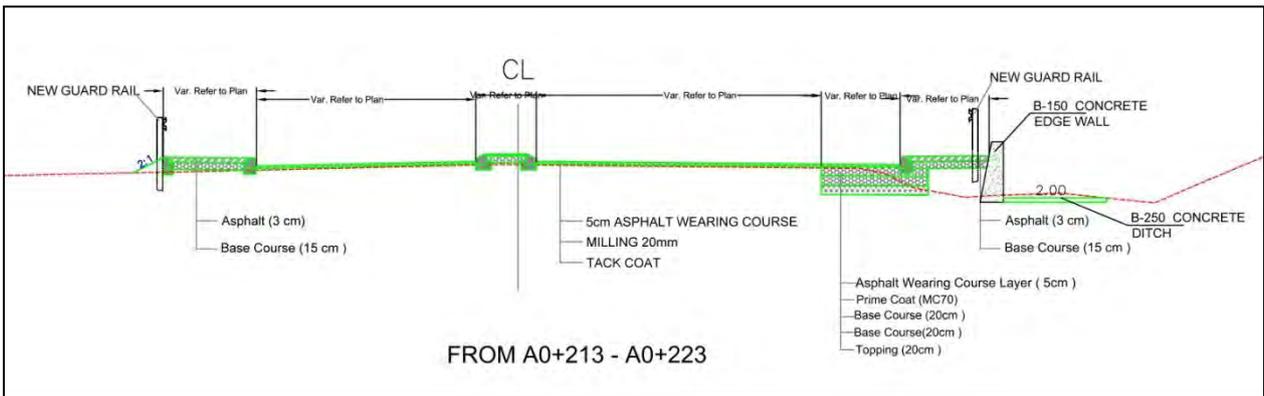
Project 07- HEB- Beit Nooon- Segment A- Typical cross section from St. A0+213 to St. A0+223.
